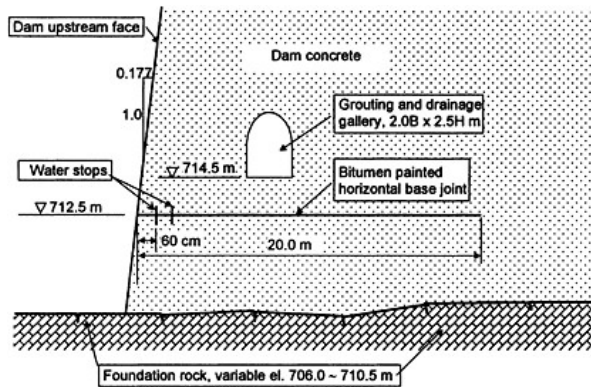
Upstream base joint for Baglihar concrete gravity dam.
